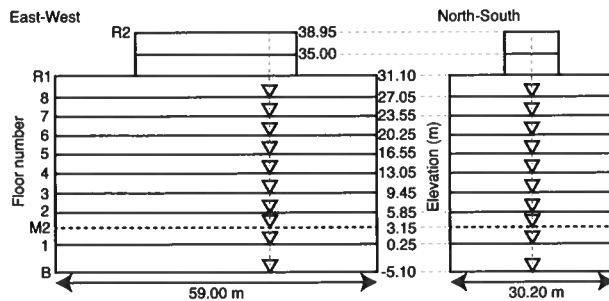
The (left) EW and (right) NS vertical cross sections of the building and the positions of receivers (triangles). Elevations denote the height of each floor from ground level. We put receivers on stairs 0.19 m below each floor except for the basement (on the floor) and the first floor (0.38 m below). Receiver M2 is located between the first and second floors. Horizontal-receiver components are aligned with the EW and NS directions.
